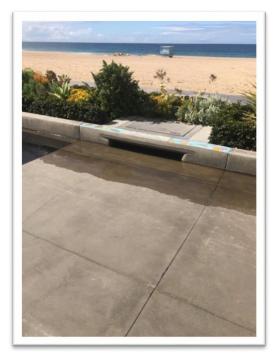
Strand Stormwater Sump #1 at 2nd Street
